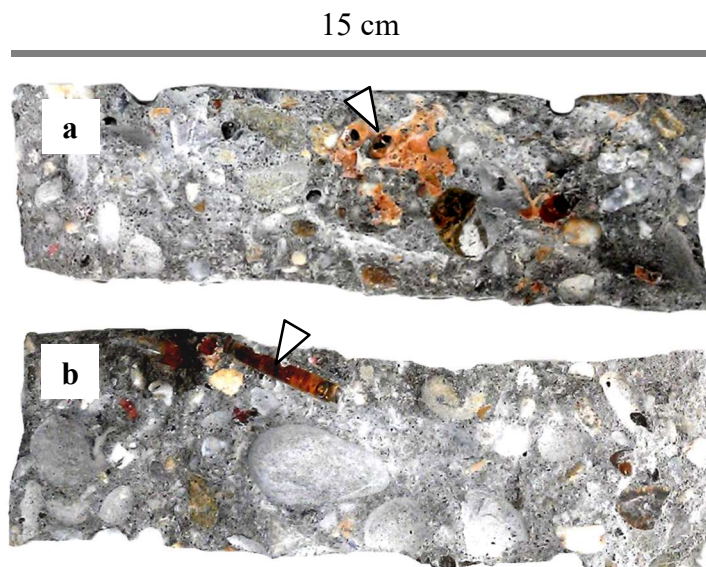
Sections of a split crack plane, where arrows show a ruptured capsule (a) and a capsule detached due to being intersected along its length (b).
